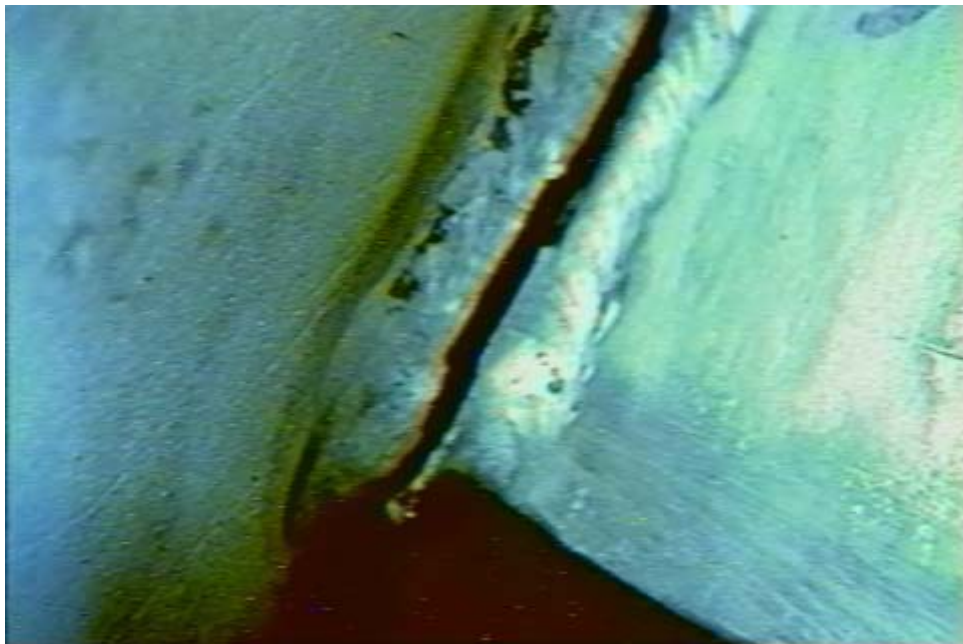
Bottom weld crack at location 15 identified in Figure B-19.
